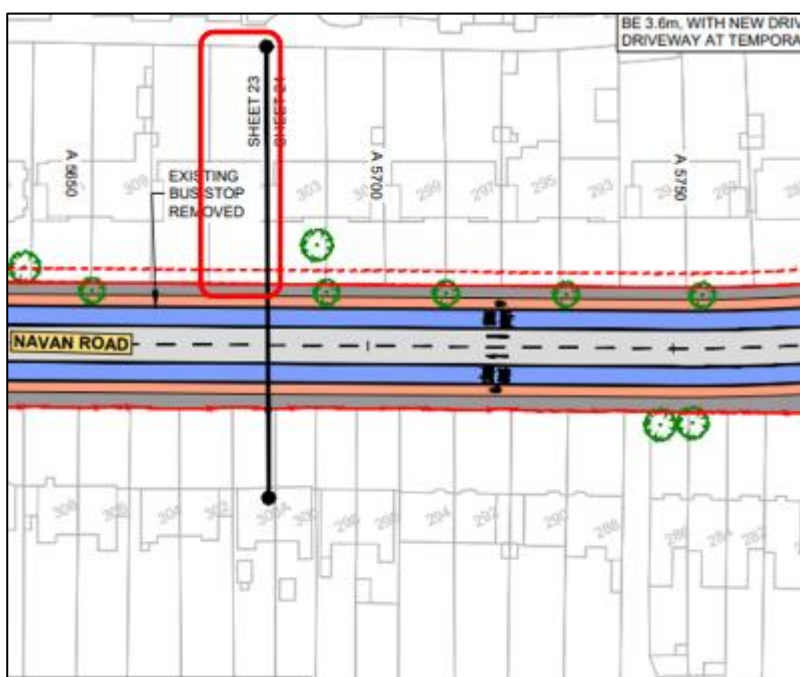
Proposed new Layout at 305 Navan Road
